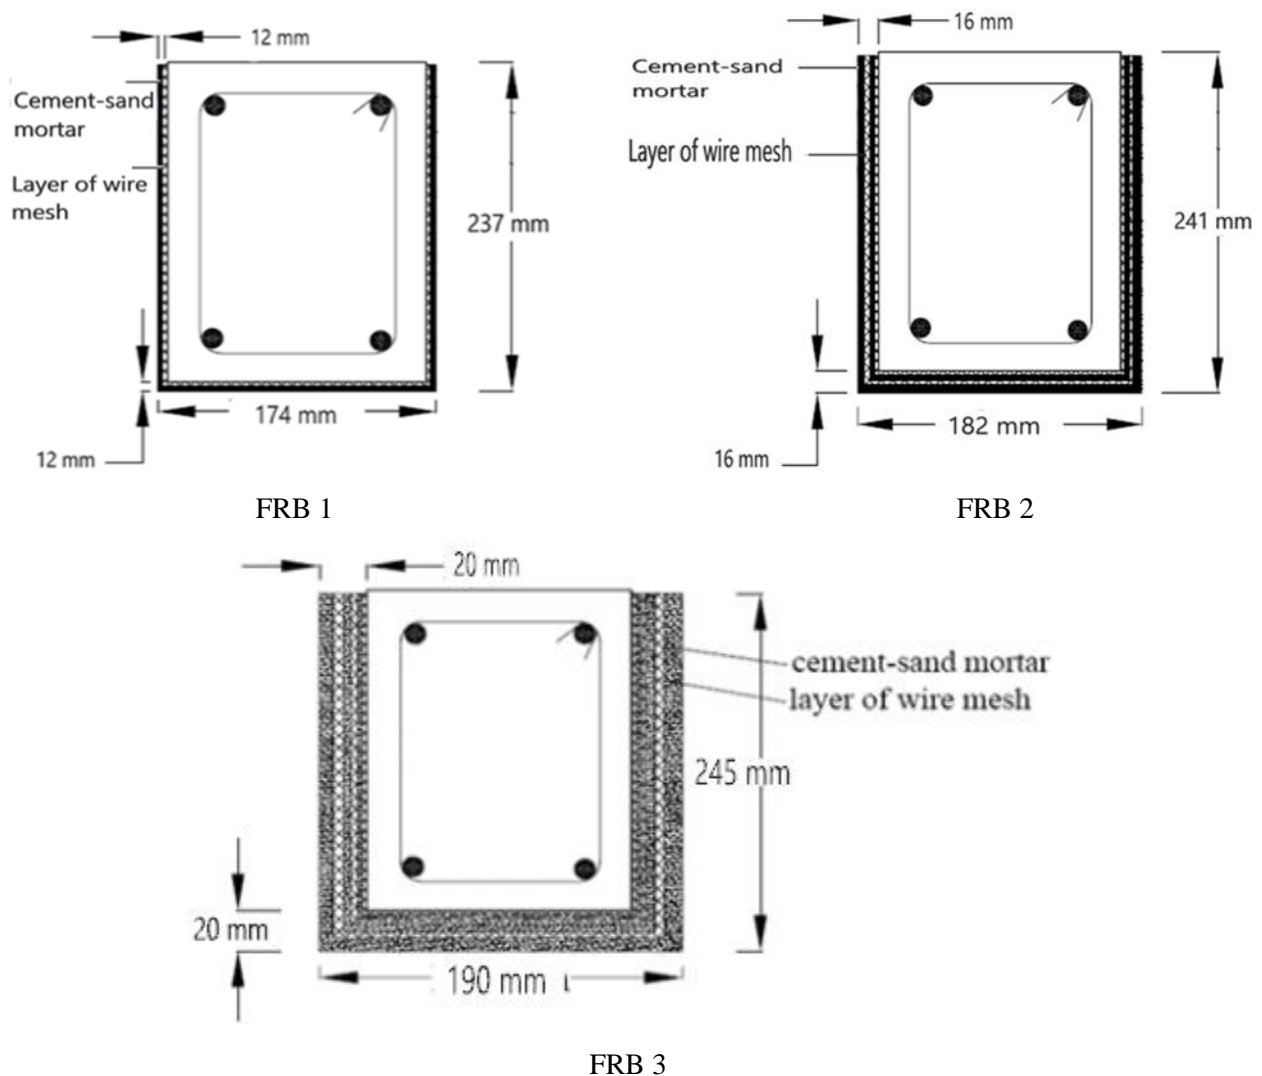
Cross-section of ferrocement retrofitted Beams [30].
